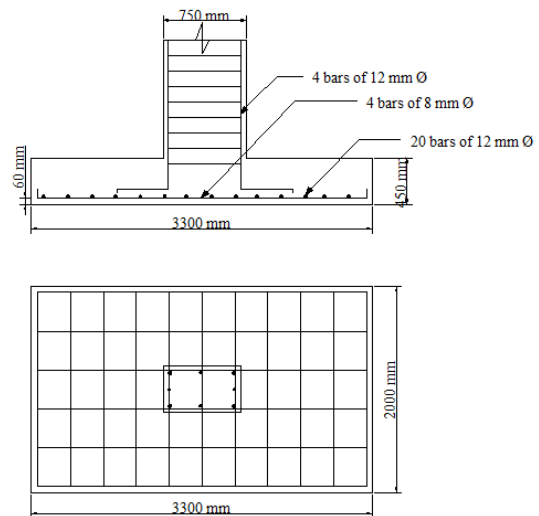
Longitudinal and sectional reinforcement of isolated footing
